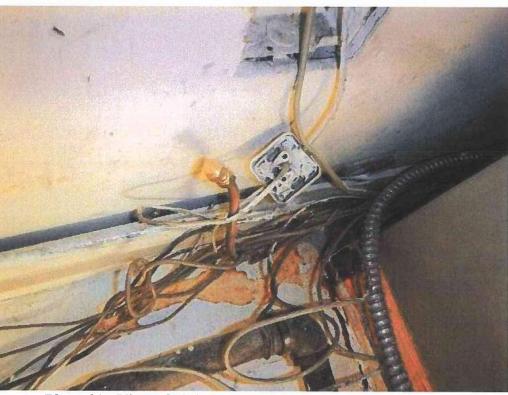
View of piping, conduit and wiring behind furnace Note: Two copper tubes (vent/fill) of the size observed in this photo are associated with heating oil tanks
